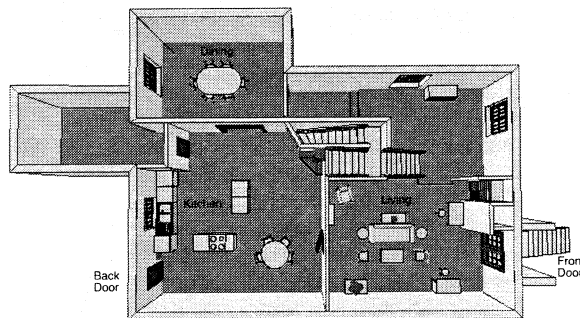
The Huxtable house, plan of main floor (not to scale).
